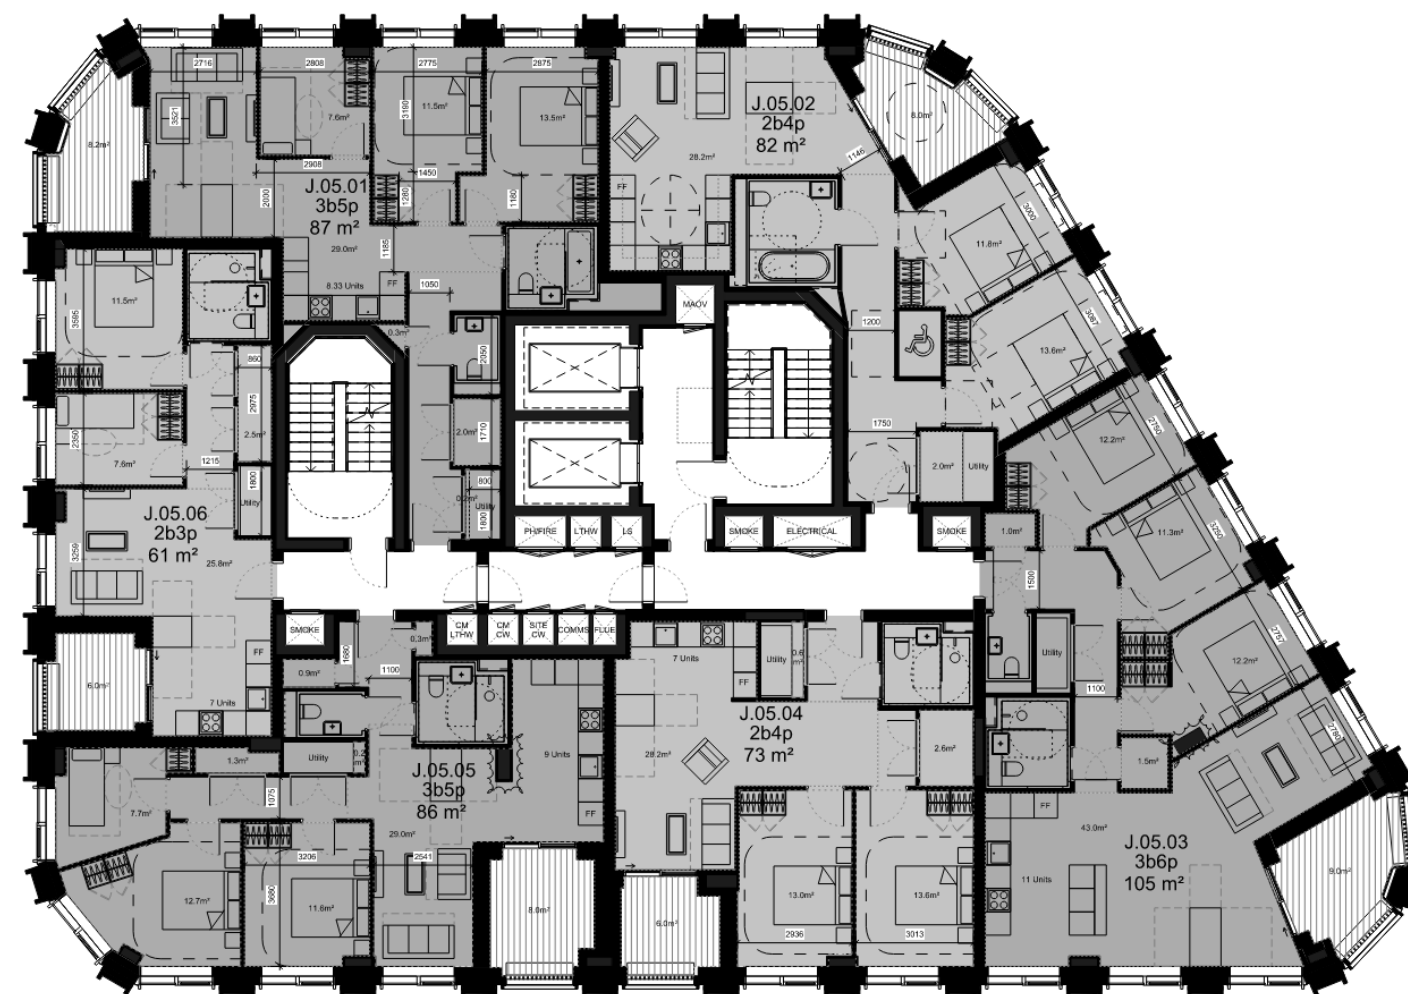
Example of Residential Apartments Floor Layout (Block J Levels 1-14 Layout)
